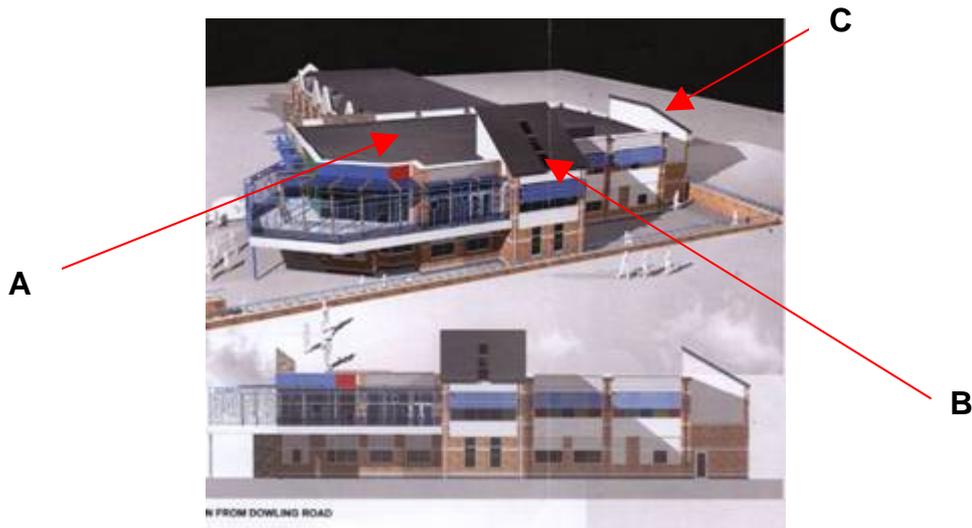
Symes Community and Library Building - proposed design showing roof areas
